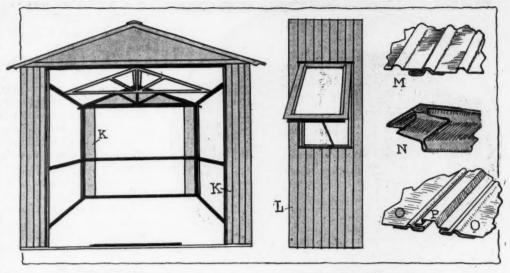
Framework, side unit and joints in Edwards' portable construction
